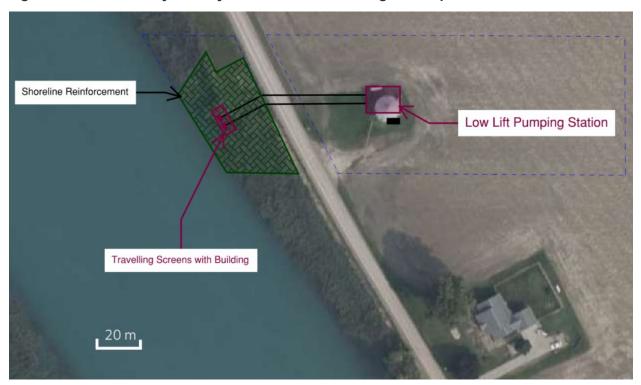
Preliminary Site Layout for Alternative Design Concept 4
